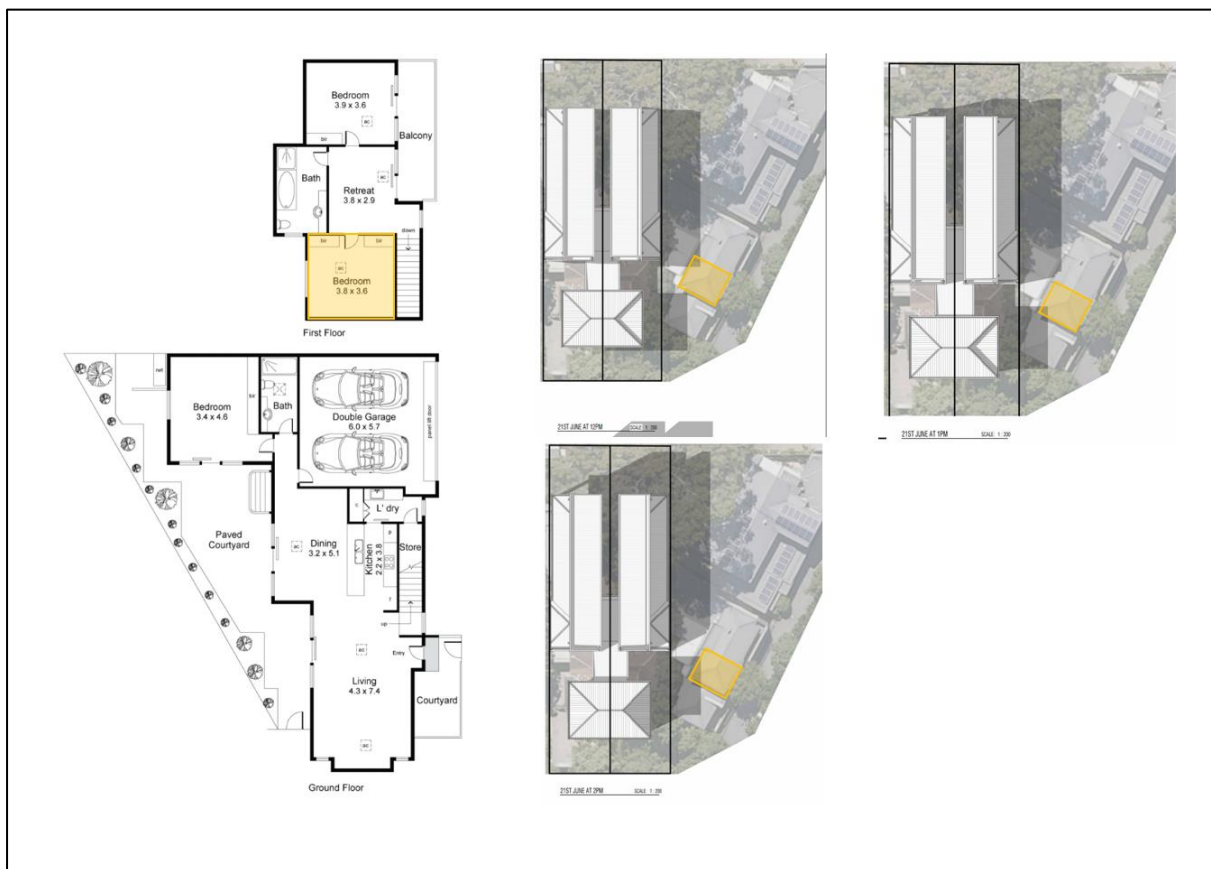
Floor plan of [REDACTED] (from 2017, source: property.com.au, and the location of the upper-level bedroom on shadow diagrams 21 June, 12pm, 1pm and 2pm).
